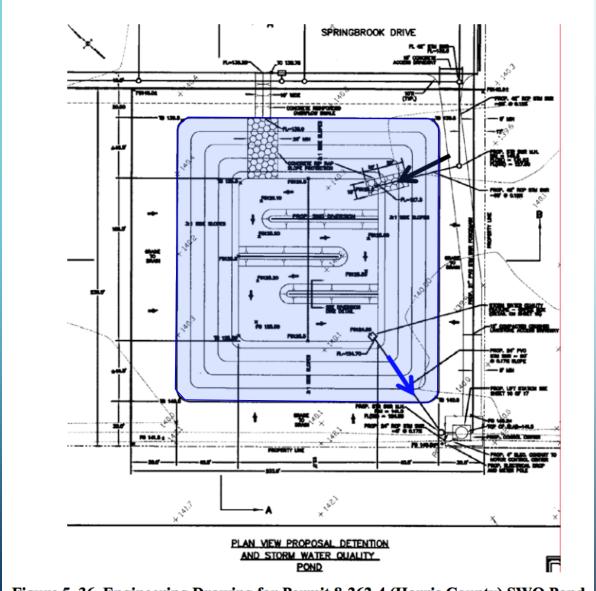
36 Engineering Drawing for Permit 8-262-4 (Harris County) SWQ Pond
